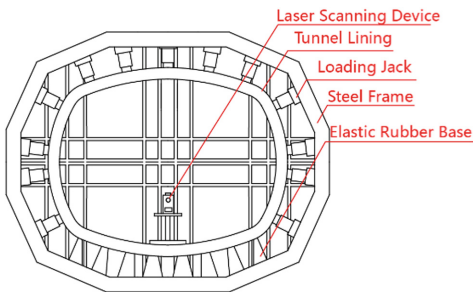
Layout of full-scale model test system for a sub-rectangular shield tunnel
